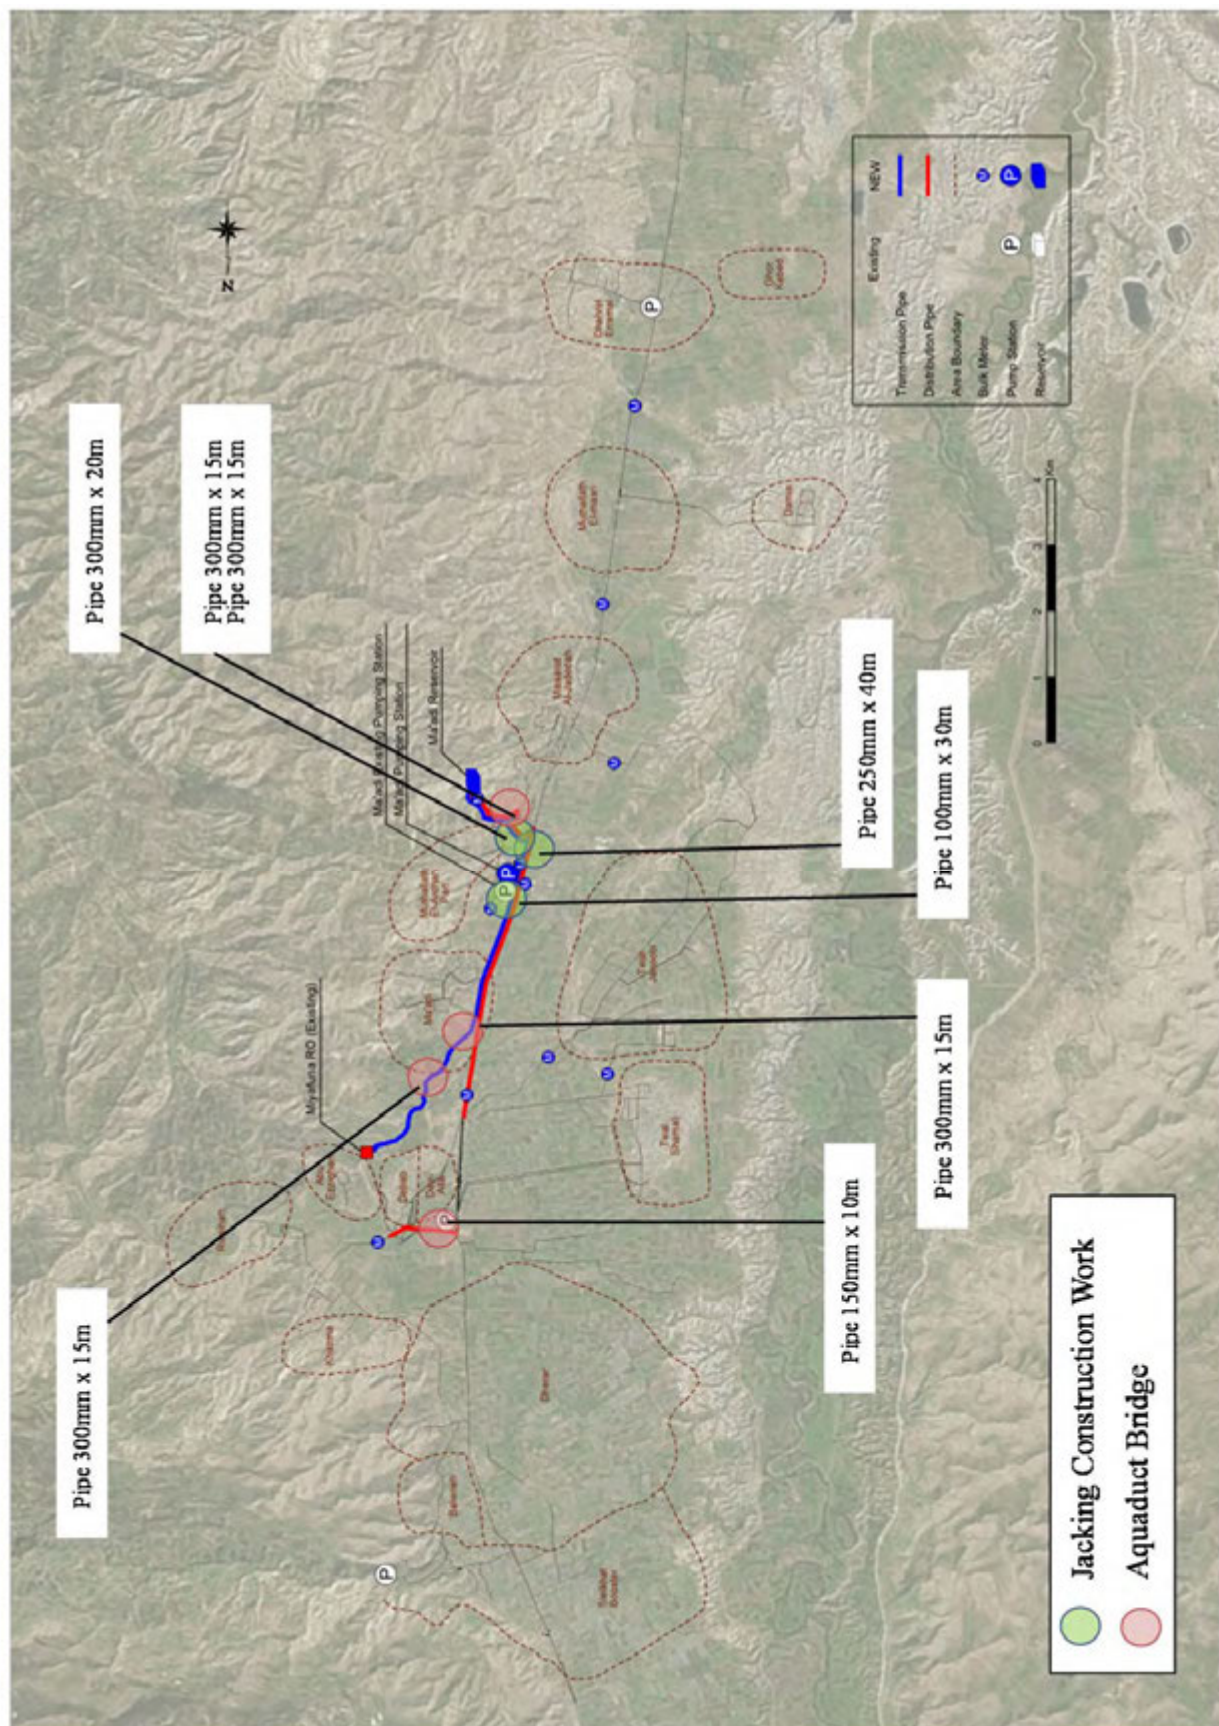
Construction locations of distribution pipeline work by trenchless construction method and by aqueduct bridges (Deir Alla)
